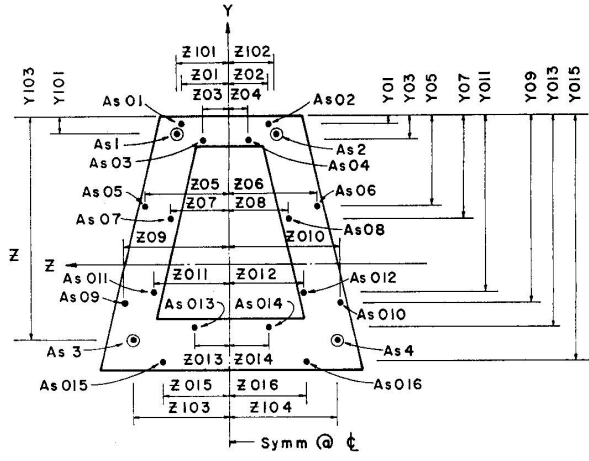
REINFORCEMENT (PRESTRESSING & NON-PRESTRESSING) DETAILS
